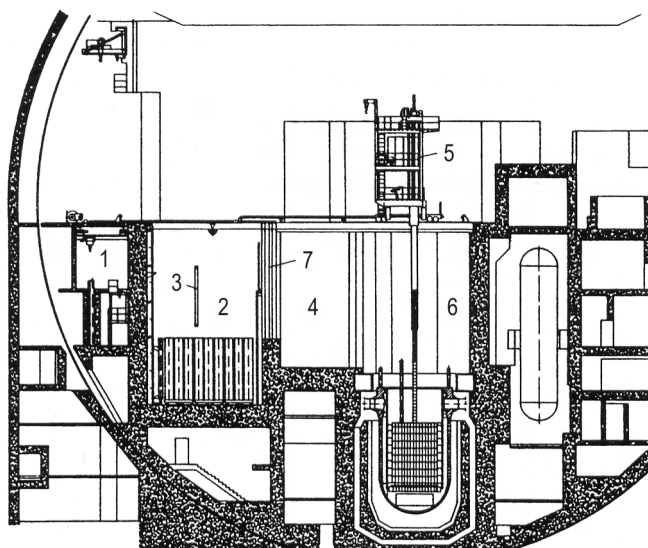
Fuel handling in a PWR, 1: storage for fresh fuel elements, 2: compact storage for spent fuel elements, 3: transportation of spent fuel elements, 4: water storage for removed core internals, 5: fuel handling machine, 6: reactor cavity, 7: dam door. (Courtesy of Framatome ANP GmbH).
